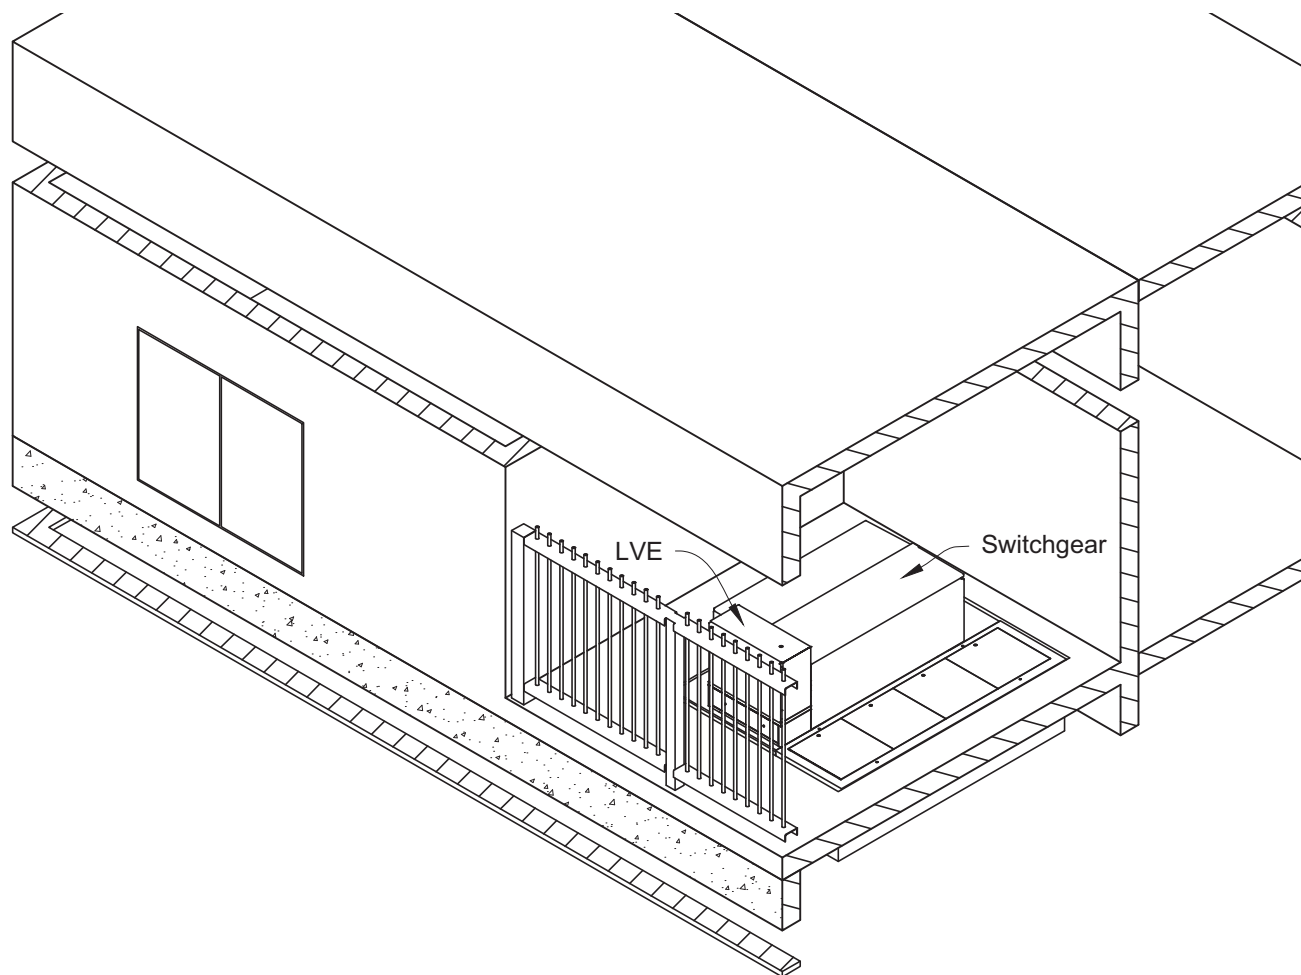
General arrangement for BC Hydro-owned over-pad switchgear inside an alcove in a customer-owned building
